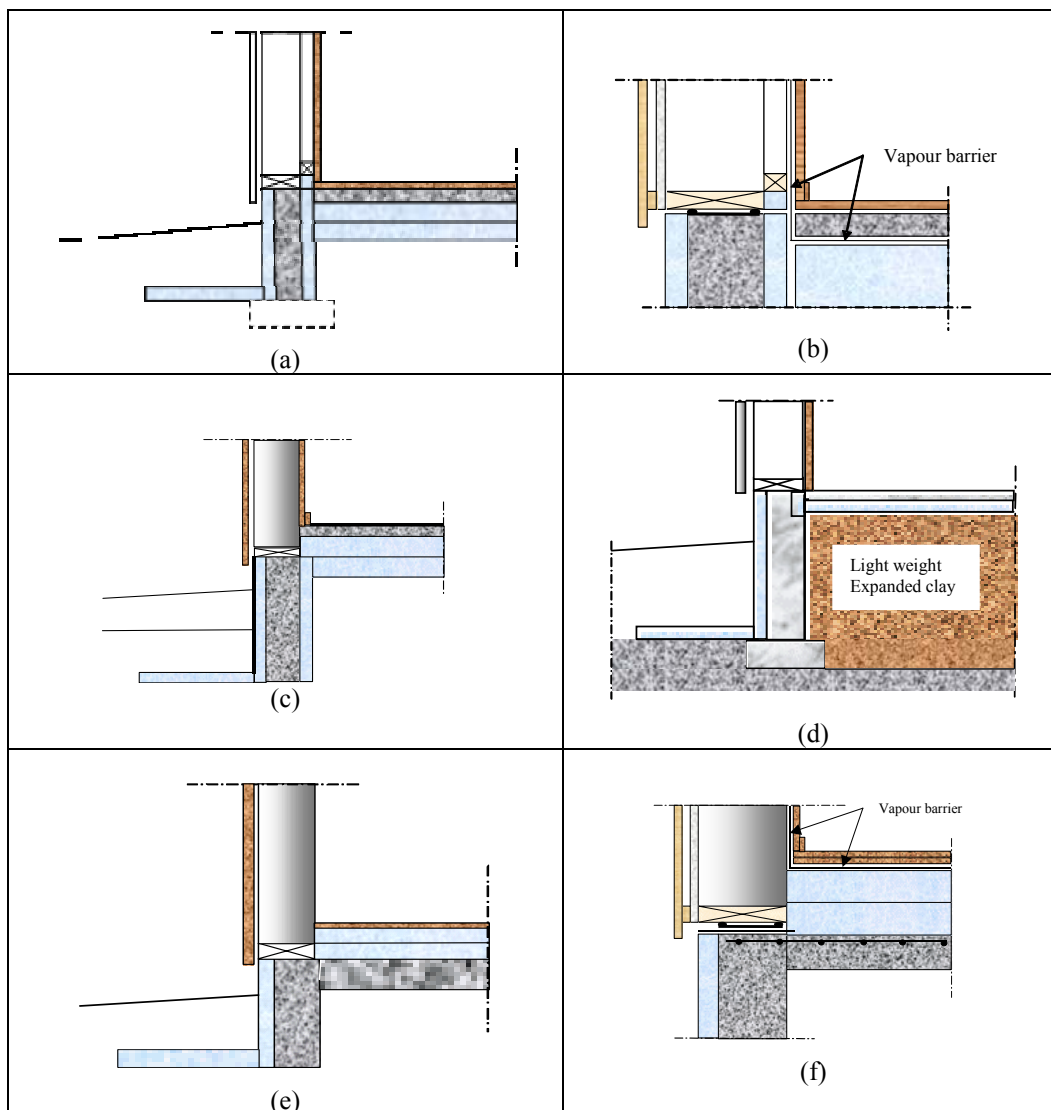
Examples of slab on ground foundations with no thermal bridging problems at the wall/floor junction.
